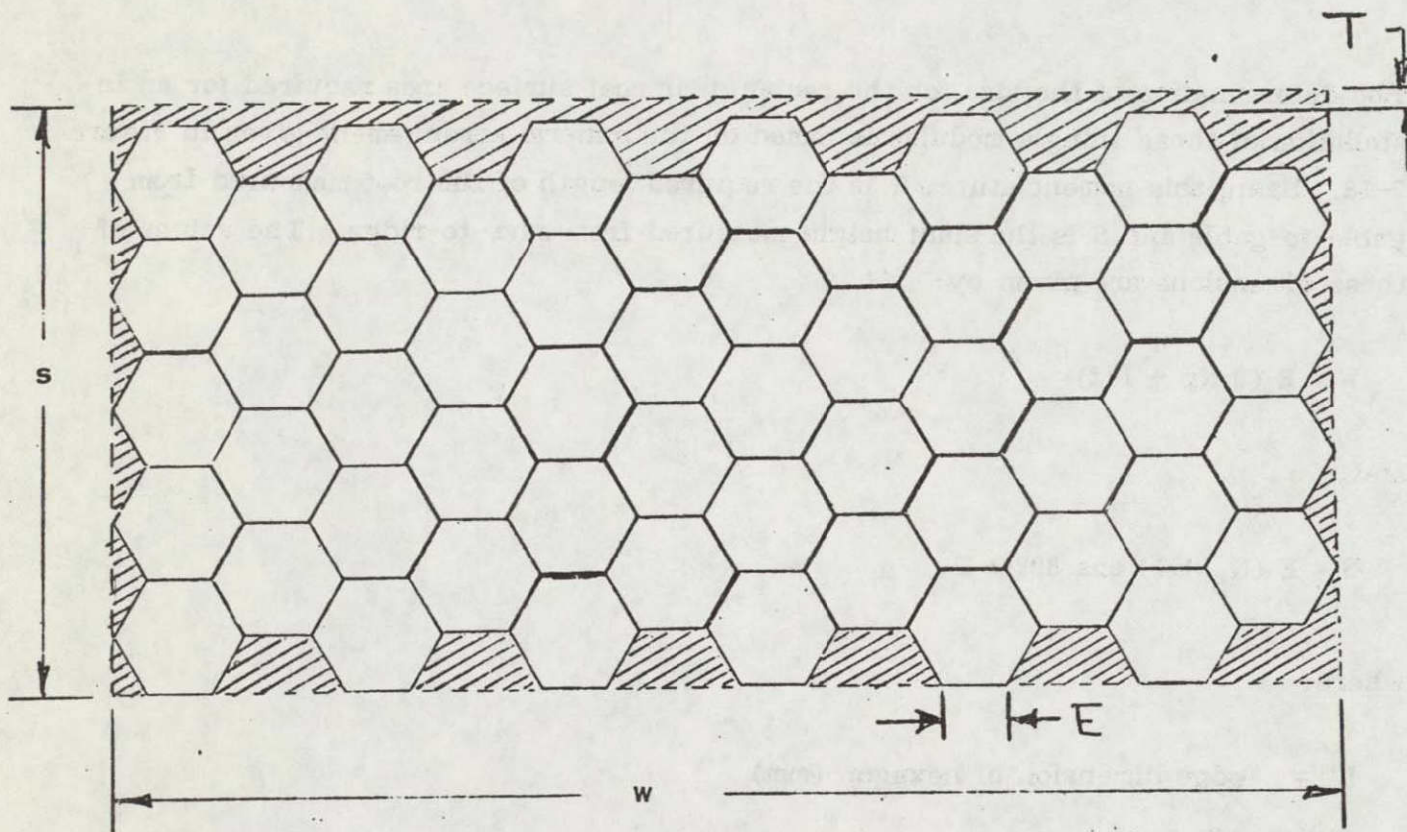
Arrangement of Shingle Modules on a Rectangular Roof
